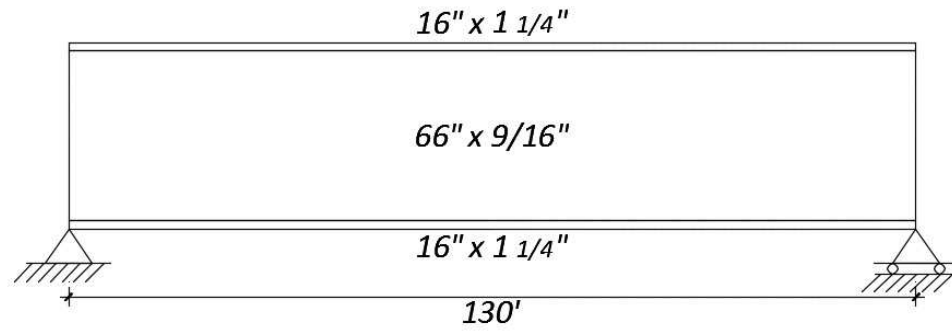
Sketch of the typical 130' one-span composite steel I-girder bridge
